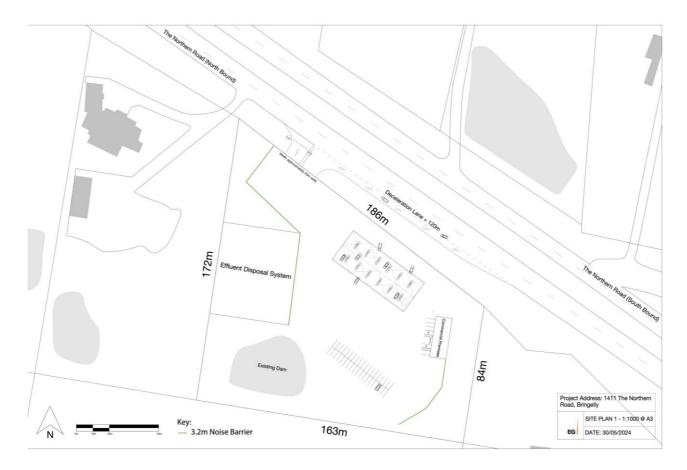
Proposed Site Layout (EG, 2024), Refer also to Appendix 1.
